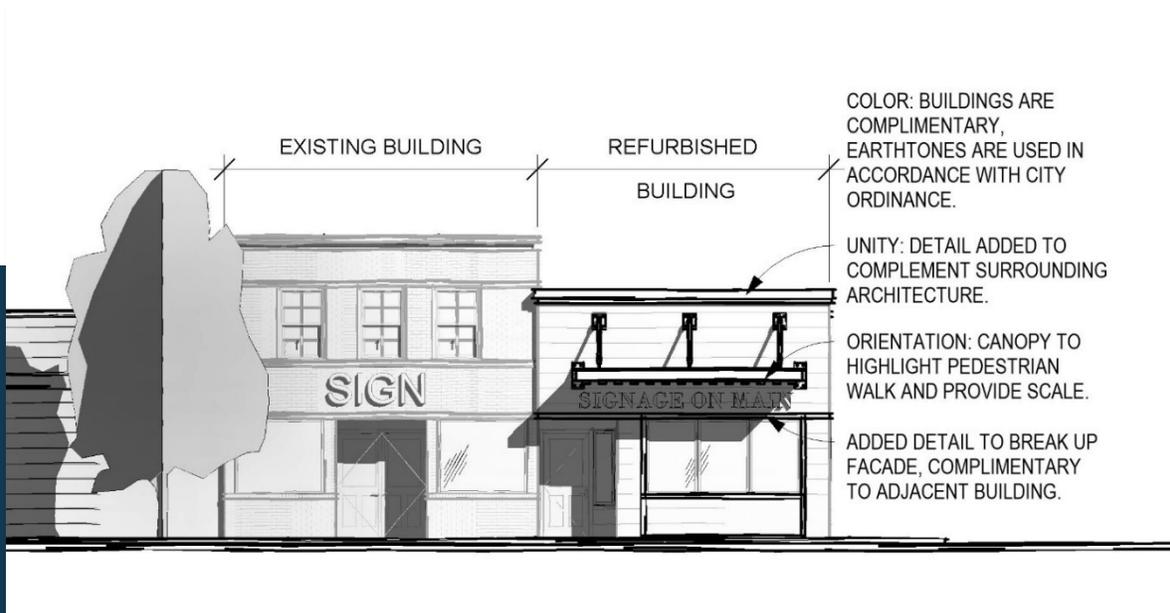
shows a typical pair of Kuna Main Street existing buildings and the potential for façade improvements to meet these guidelines.
